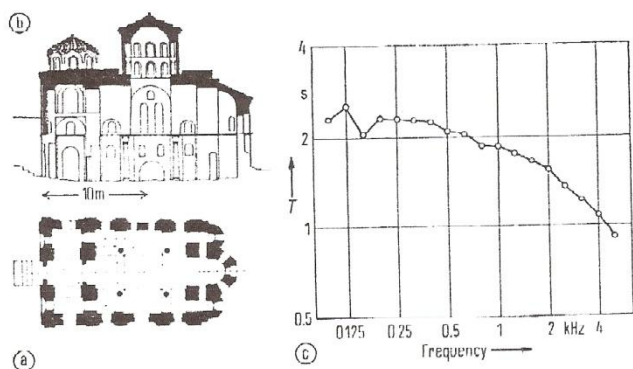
Church of Panagia Chalkeon. (a) Ground-floor plan, (b) cross-section and (c) reverberation time  $T$ .
